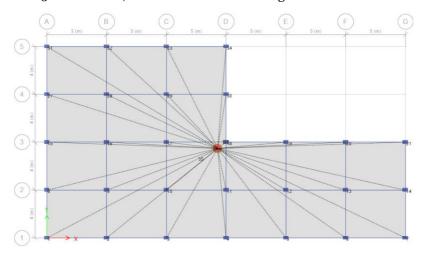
Typical Floor Plan of 5 &10 Storey Models
